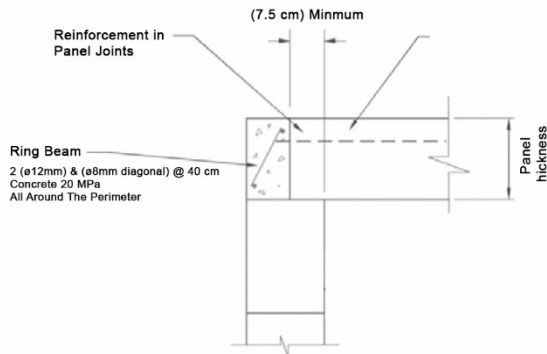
Typical detail of panels supported on ASLAN AAC Wall.
